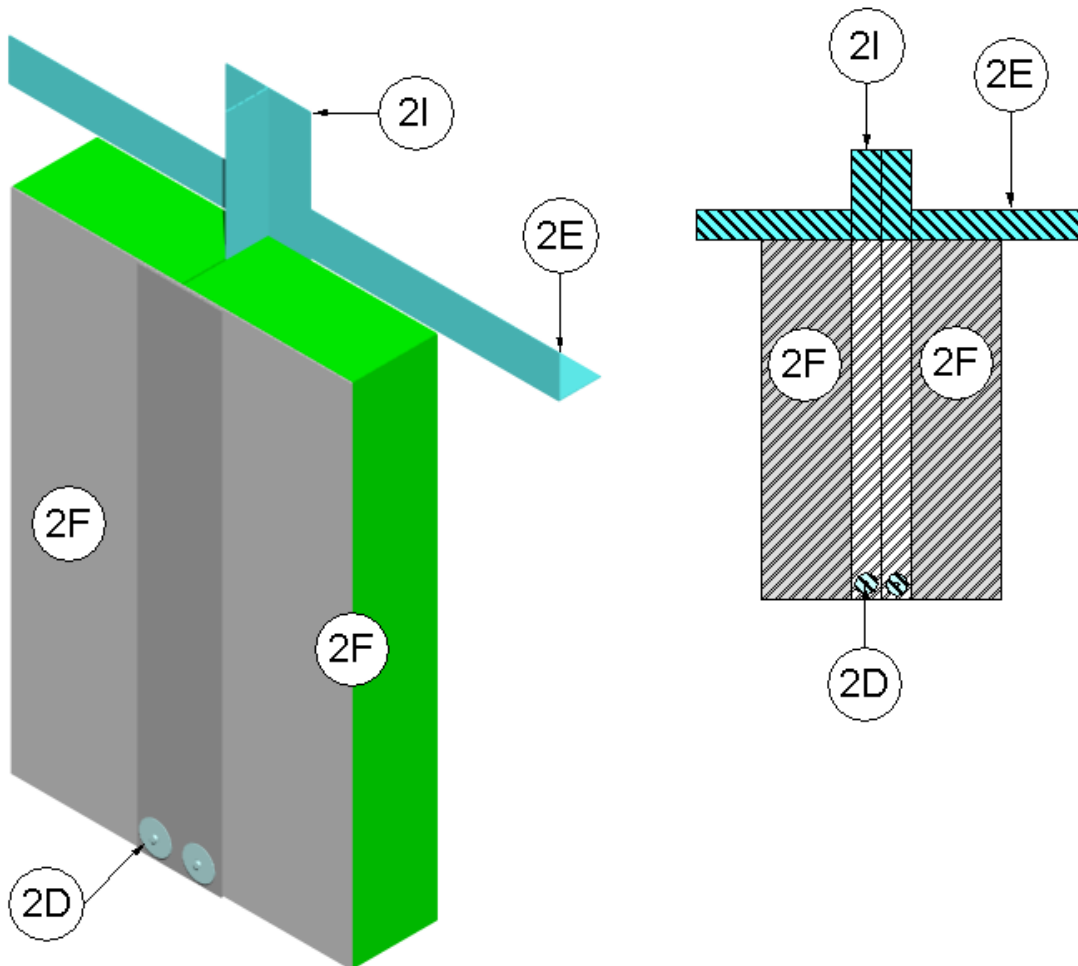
Curtain wall insulation vertical butt joint isometric and elevation
